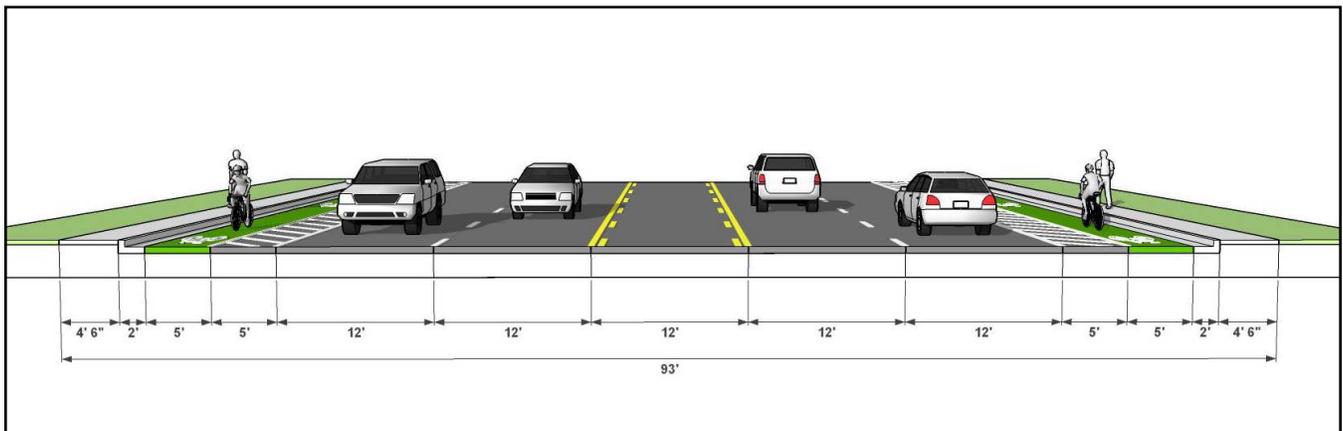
Southern Transition Zone – Proposed Typical Section
